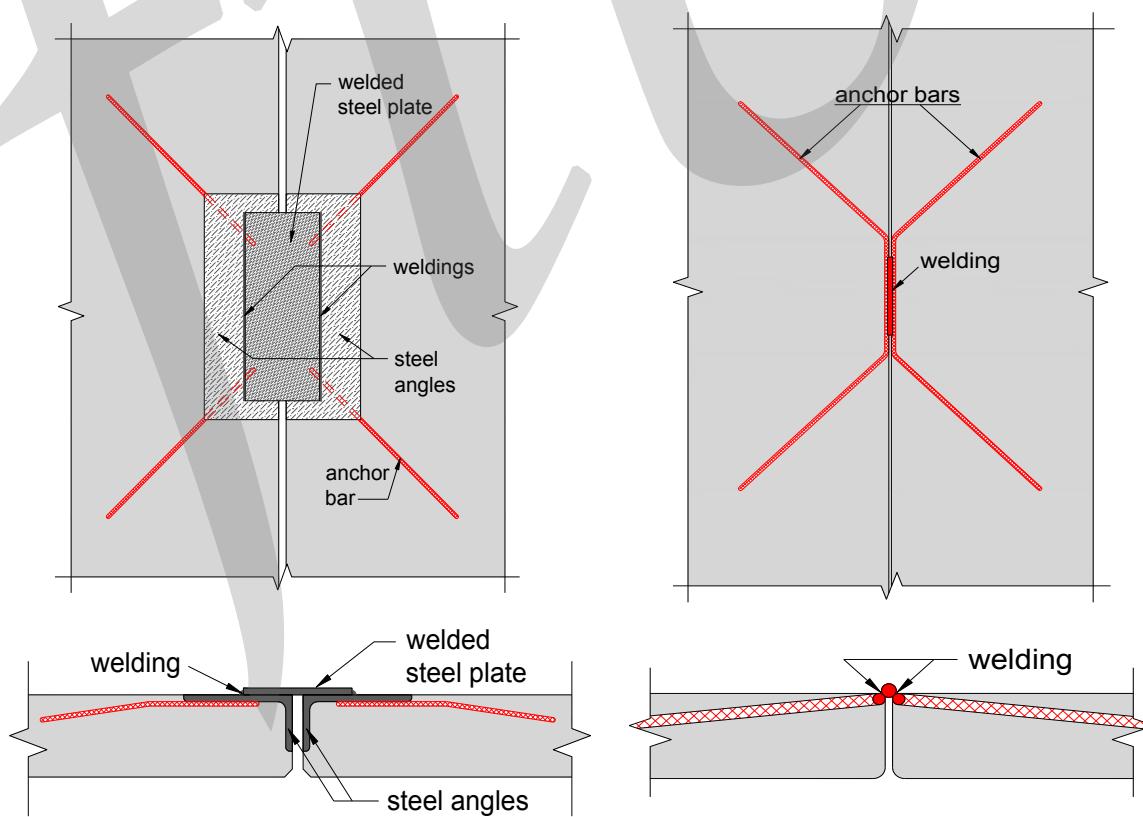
Typical flange weld connections between double-tee floor units
